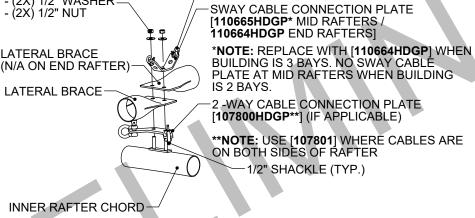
PLATES SHOULD BE POSITIONED 30 DEGREES FROM CENTER OF FRONT OF CHORDS
